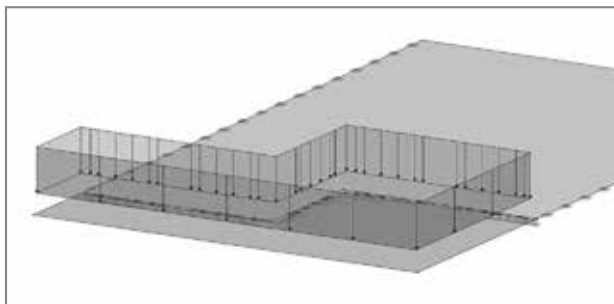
Schöck Isokorb® T type K-E, K-T: 3D view of the load on the balcony; left and right slab support restrained
